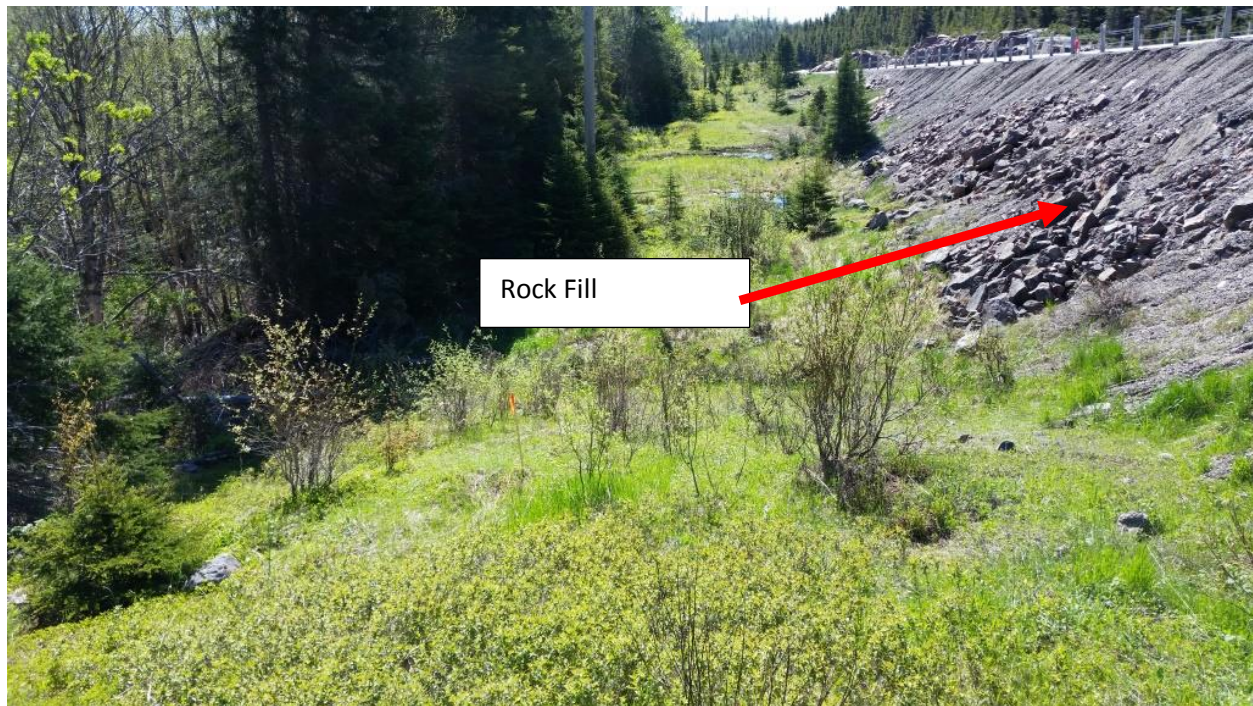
Looking toward east – Rock Fill (June 2017)
